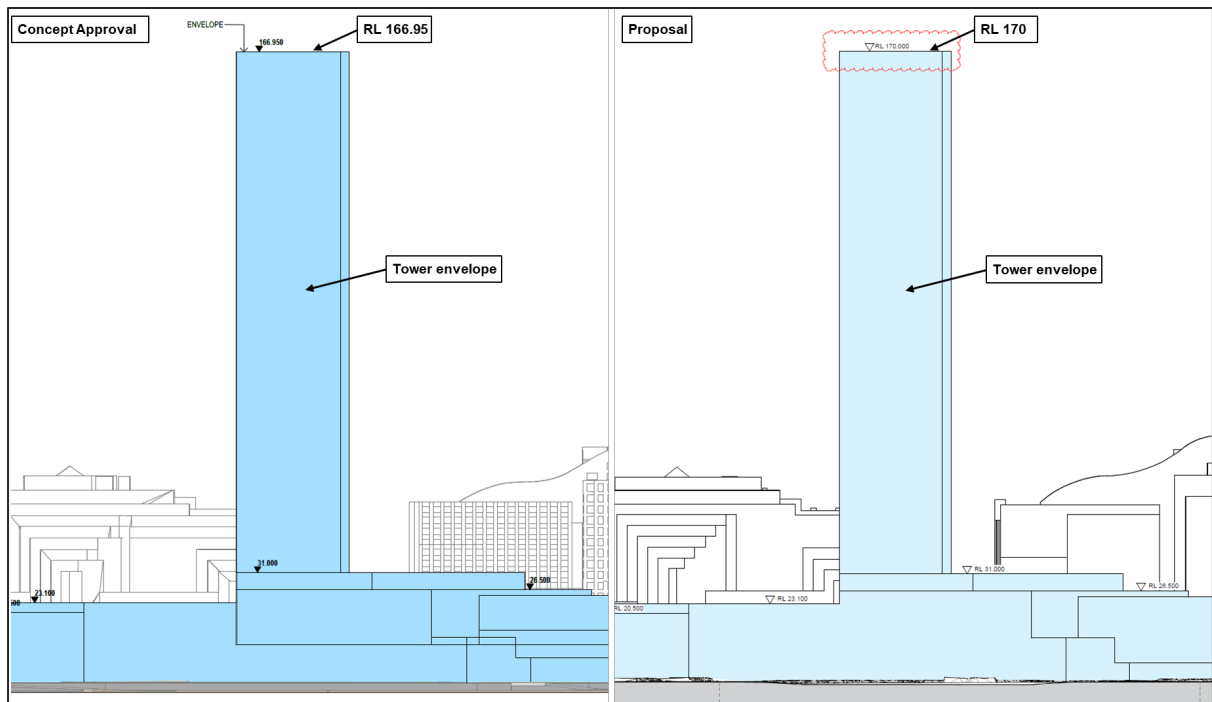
| Concept Approval (left) and proposed modified (right) tower building envelope (Base source: Applicant's Modification application)
